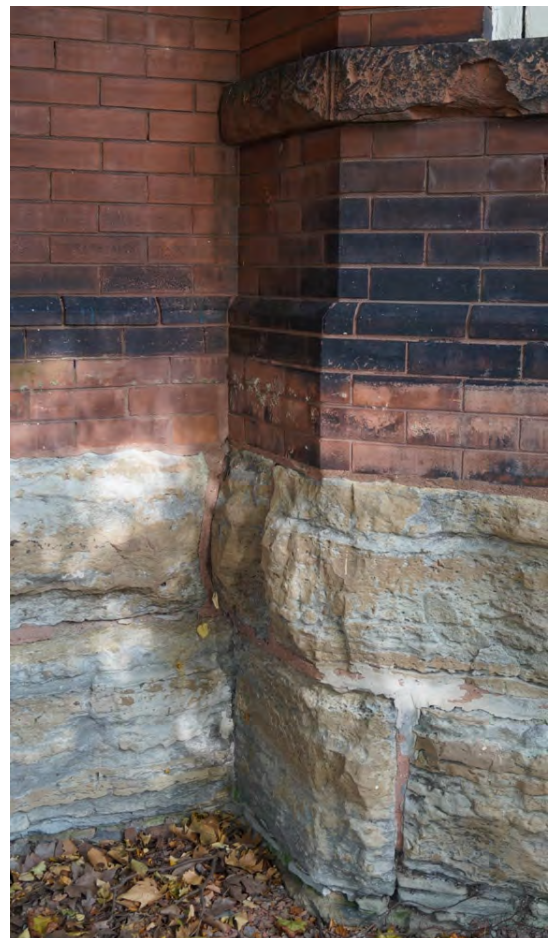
Detail of rock-faced limestone foundation, red-pressed brick with rodded joints and red rock-faced sandstone sill. Note water table above foundation wall.
